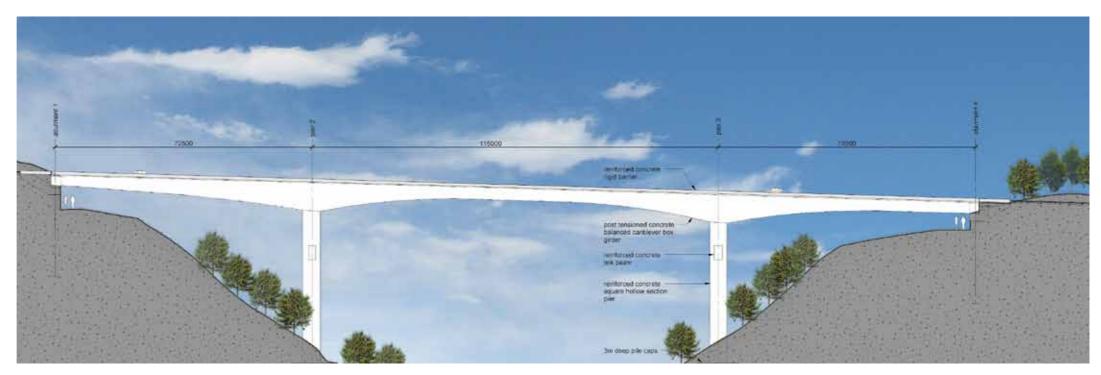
Bridge 20 Cannons Creek Bridge elevation
